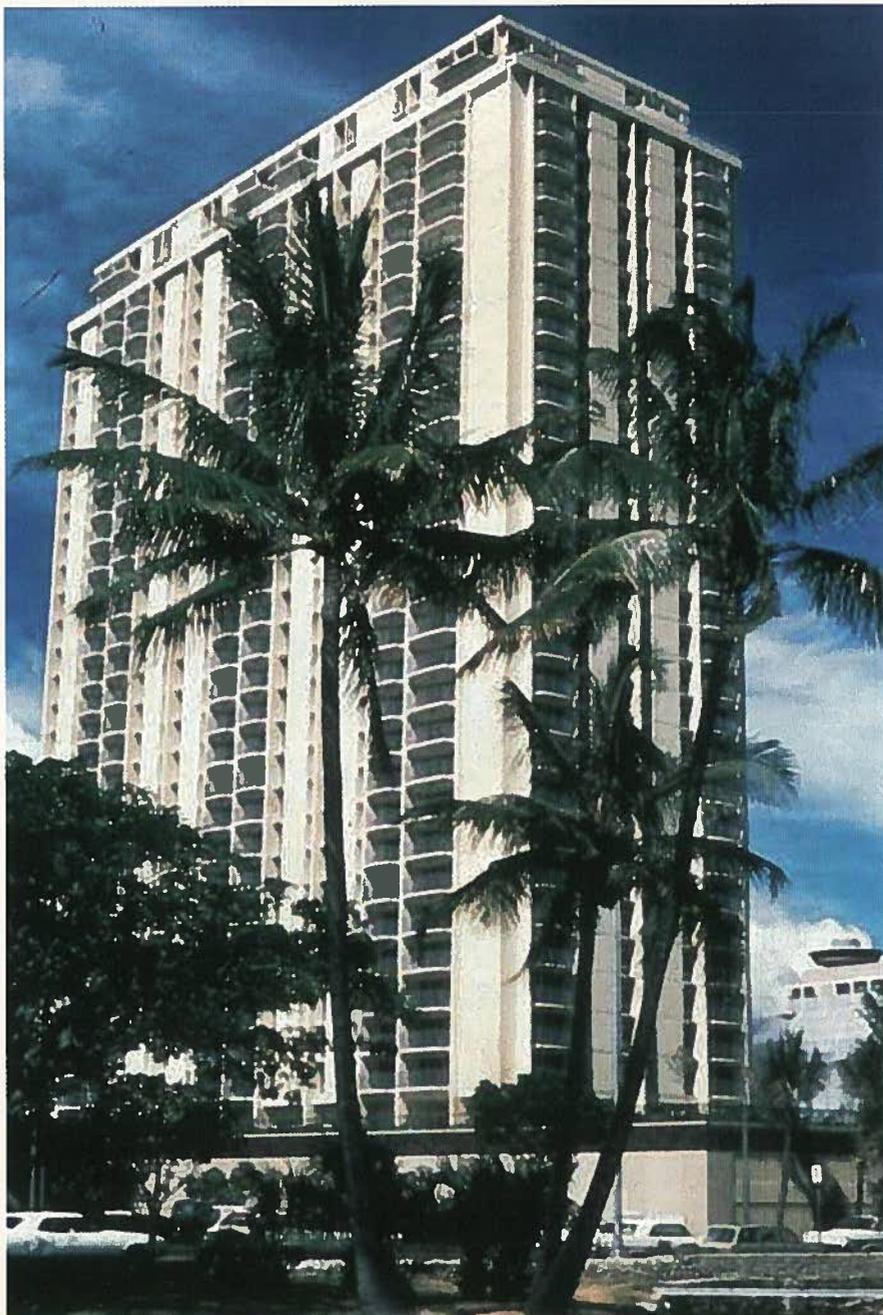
Ala Moana Apartments, Honolulu, Hawaii (built in 1966). The framing of this 33-story building consists of precast, prestressed concrete floor slabs $3\frac{1}{2}$ in. (89 mm) thick, with an in situ composite topping $2\frac{1}{2}$ in. (63 mm) thick, for a total slab thickness of 6 in. (152 mm). For the floor loads and spans required, a conventional floor slab would need to have a total thickness of 9 in. (229 mm). Total savings in concrete for the floor slabs alone on this building would be equivalent to a block of concrete 8.34 ft (2.54 m) thick, covering the entire footprint of a typical floor. Not only would this result in considerable savings in material and costs required for the column, beam, bearing wall and foundation support system but with the height restrictions in this area, one extra floor of saleable apartments can be realized within the cumulative void area due to reductions in floor slab thicknesses.
